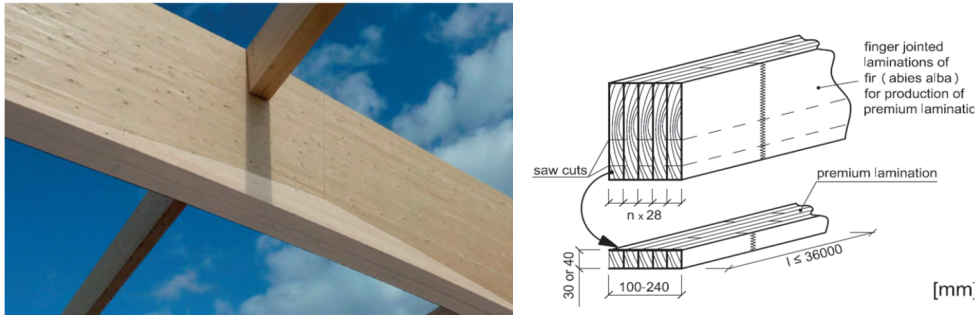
Details of a large glued connection: assembled spliced beam (the wedge shaped fitting is highlighted) (left) [51], premium laminations (right) [50]
